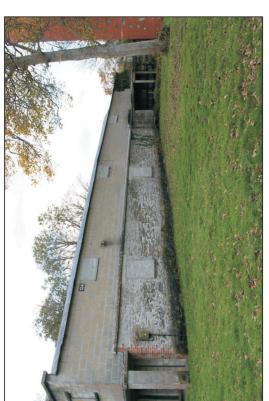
Building 77, The Ship showing the reused stone boundary wall, viewed from the northeast. 1m scale
